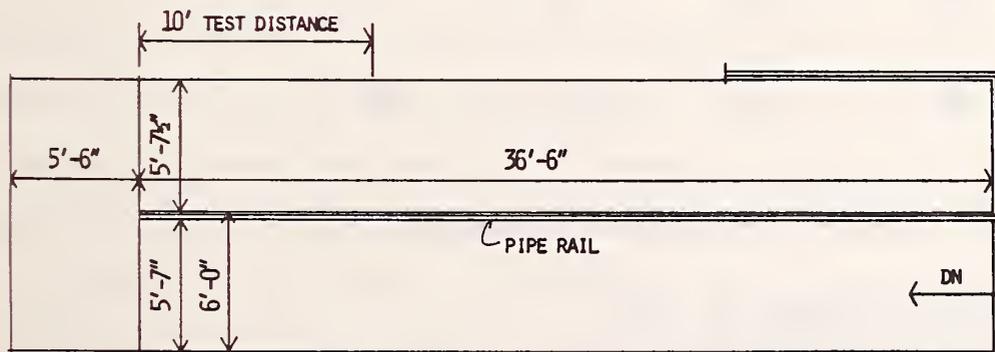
LOWER LEVEL RAMP PLAN AND SECTION
